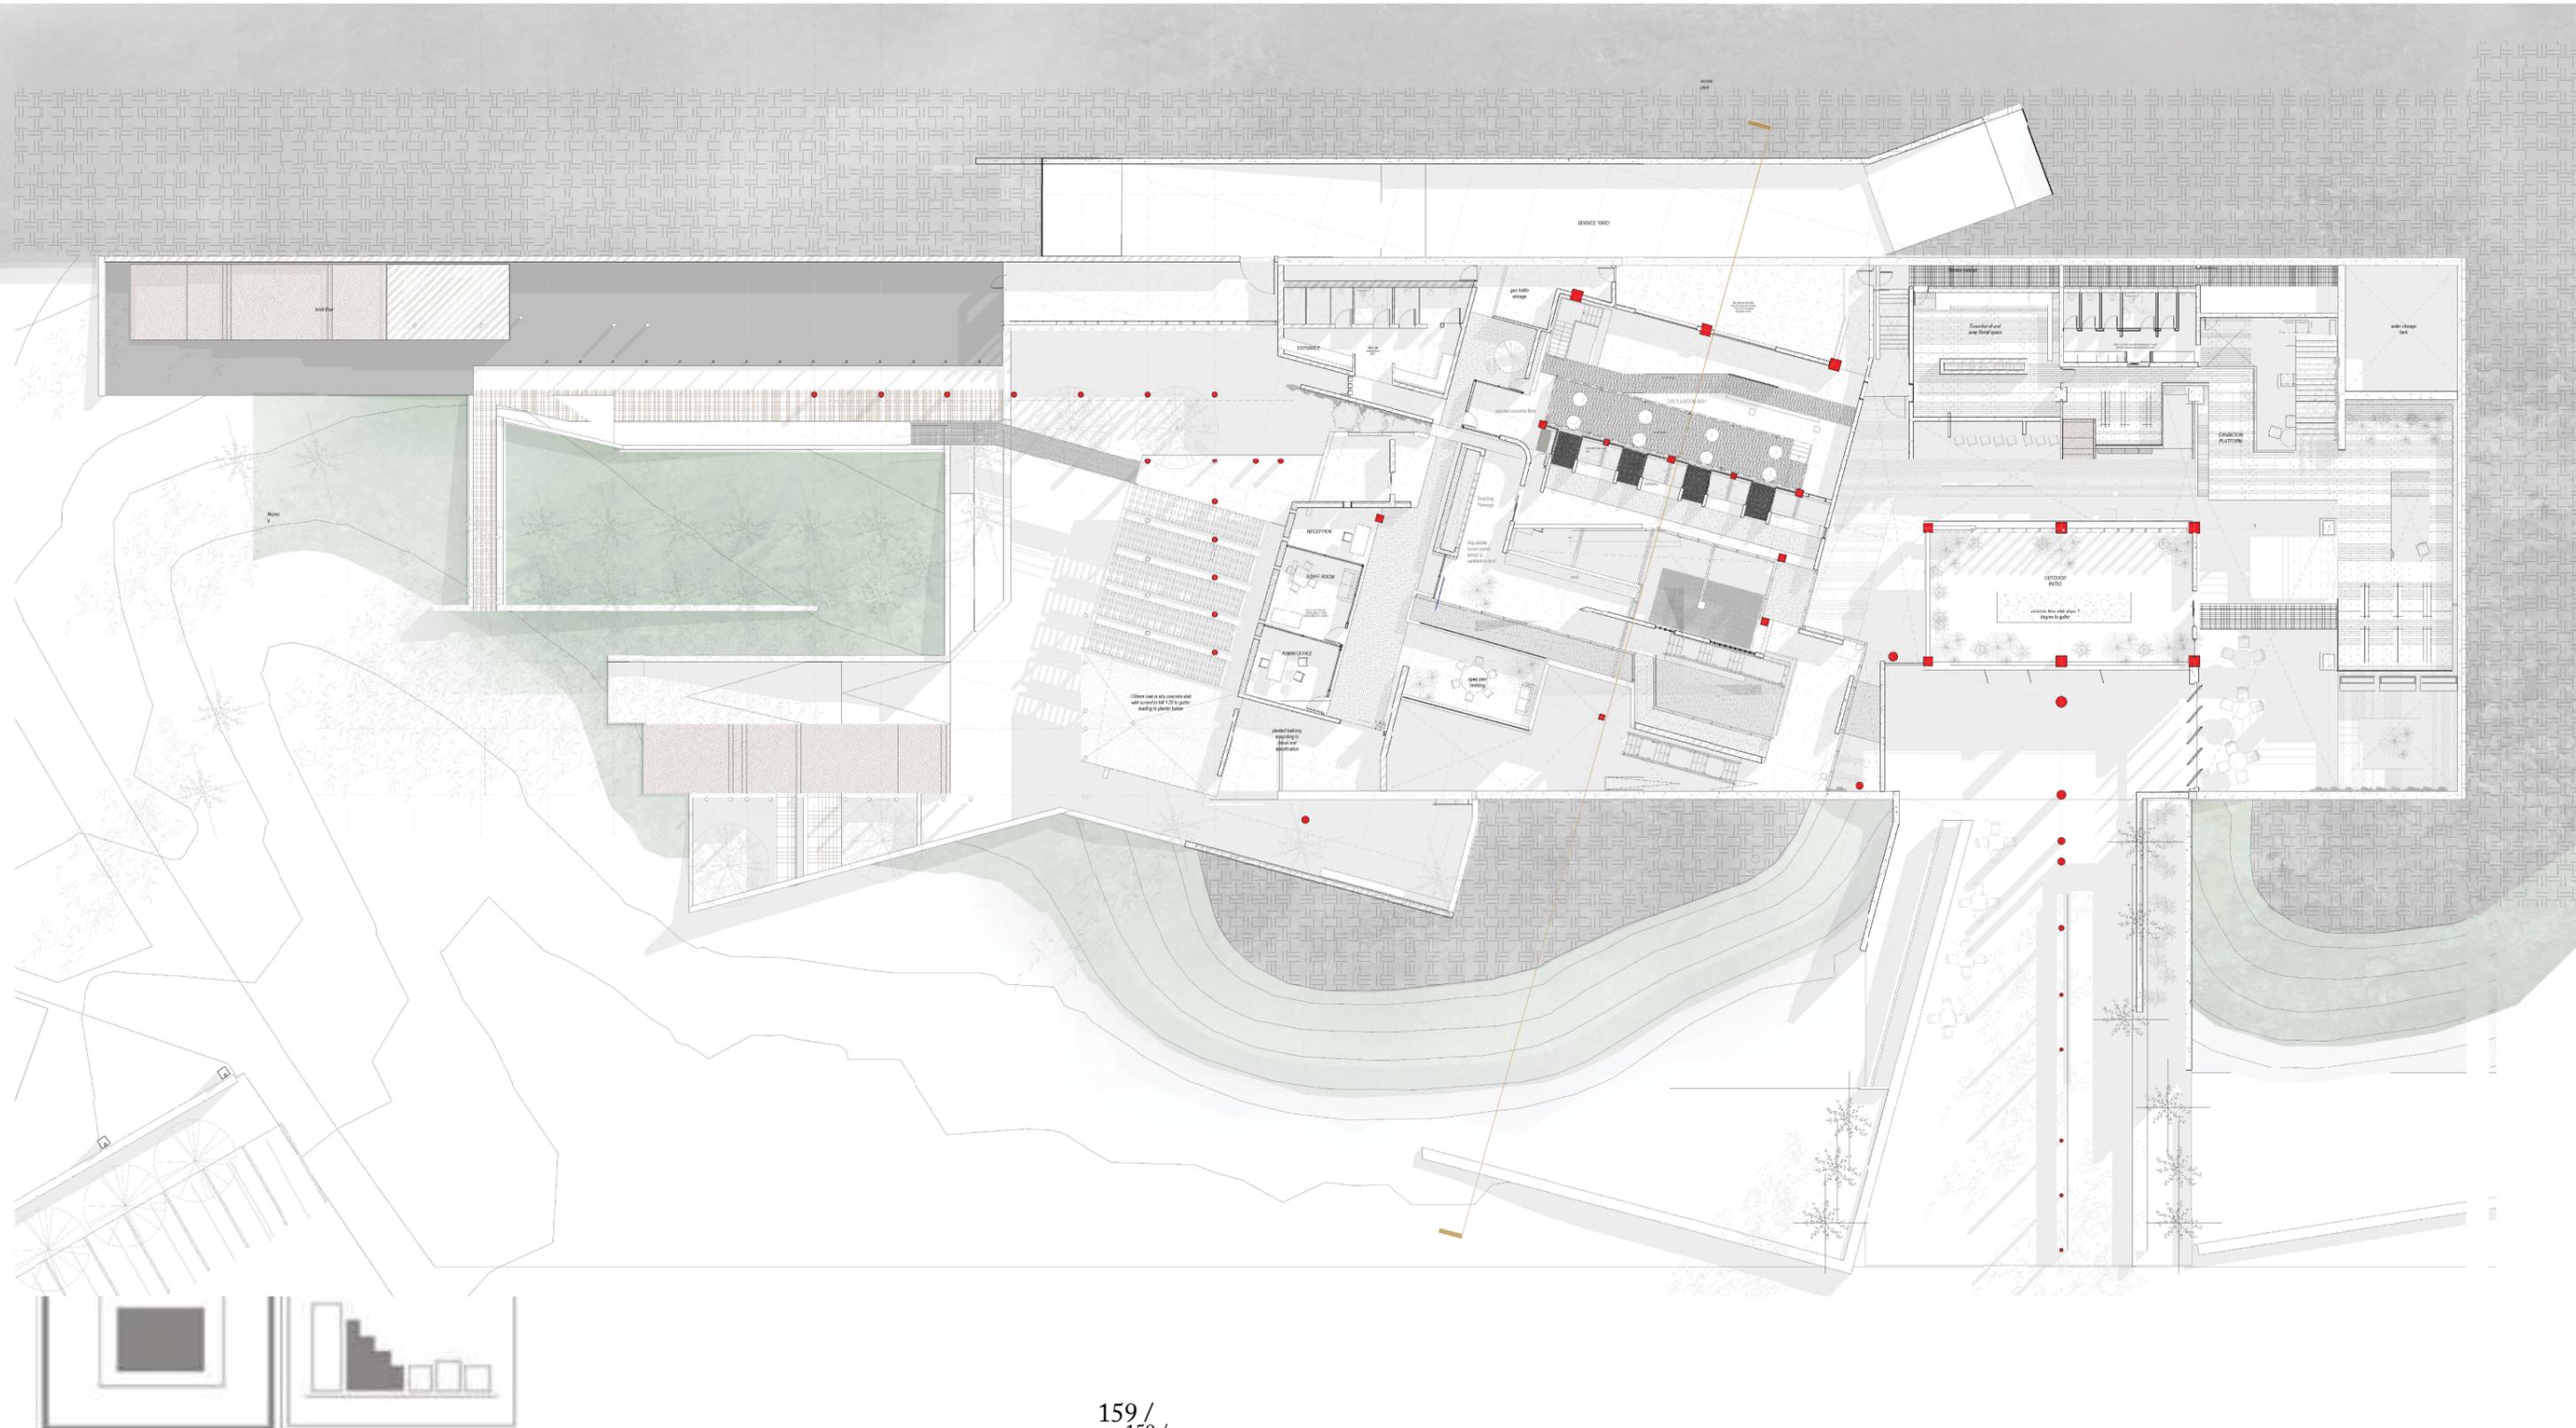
Ground Floor Plan Iteration 7 (not to scale) (Author: 2018).
